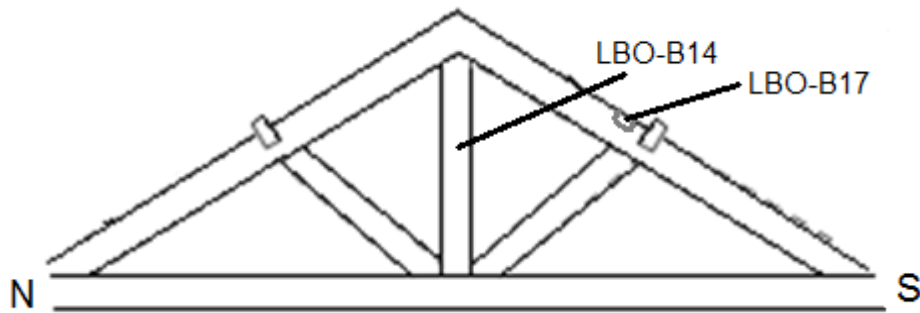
Former farmhouse, truss 2, showing the position of samples LBO-B14 and LBO-B17
